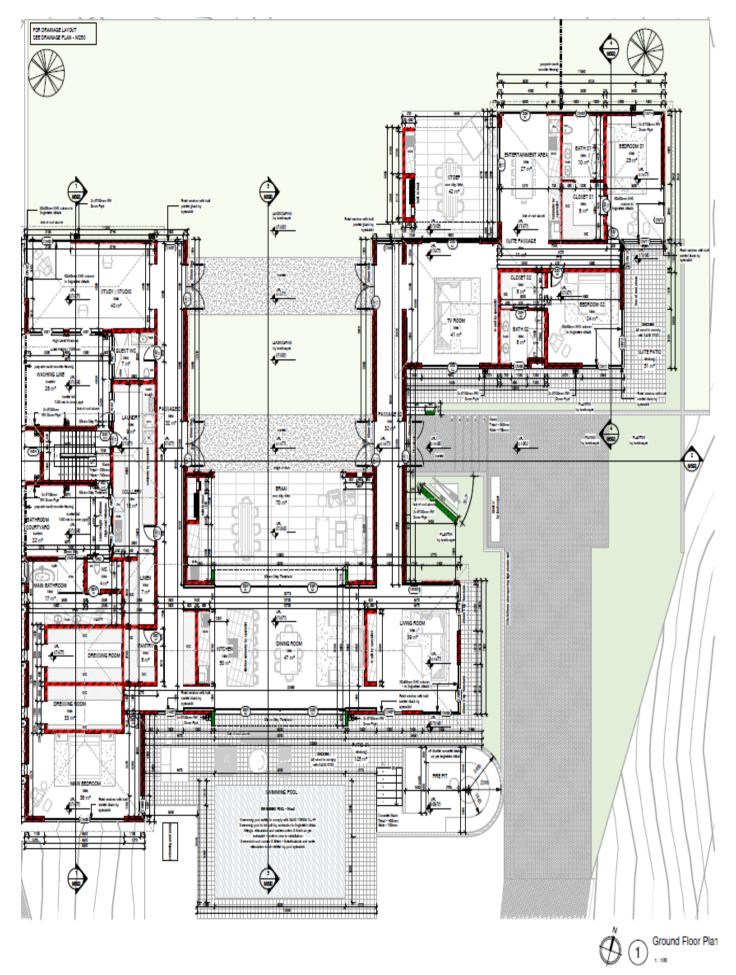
Ground Floor Plan (Mathews + associate architects, 2024)
